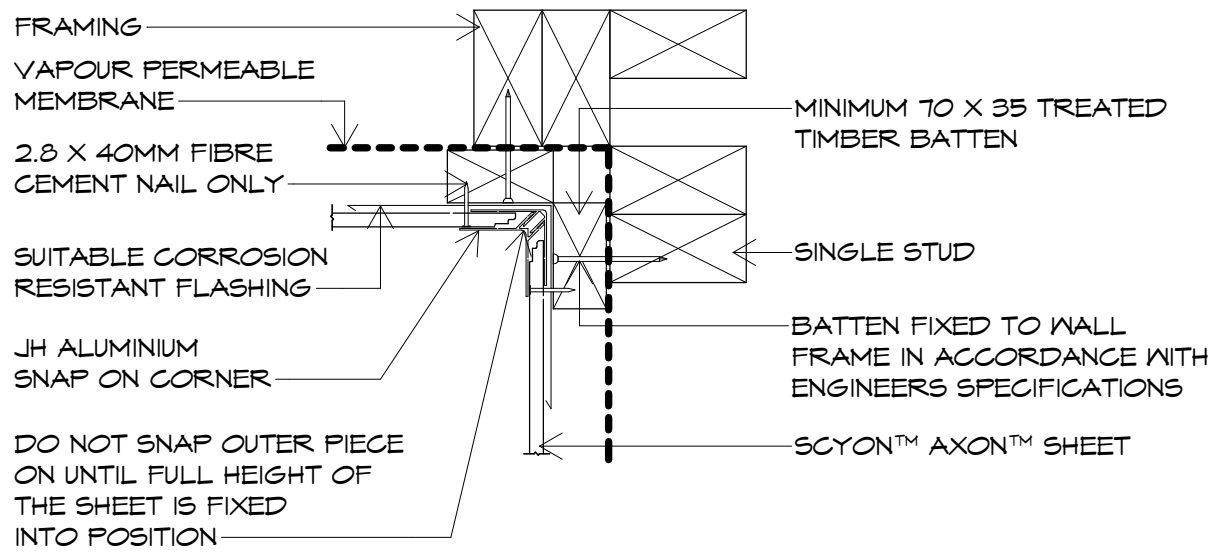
VERTICAL JOINT - INTERNAL CORNER ON BATTENS
